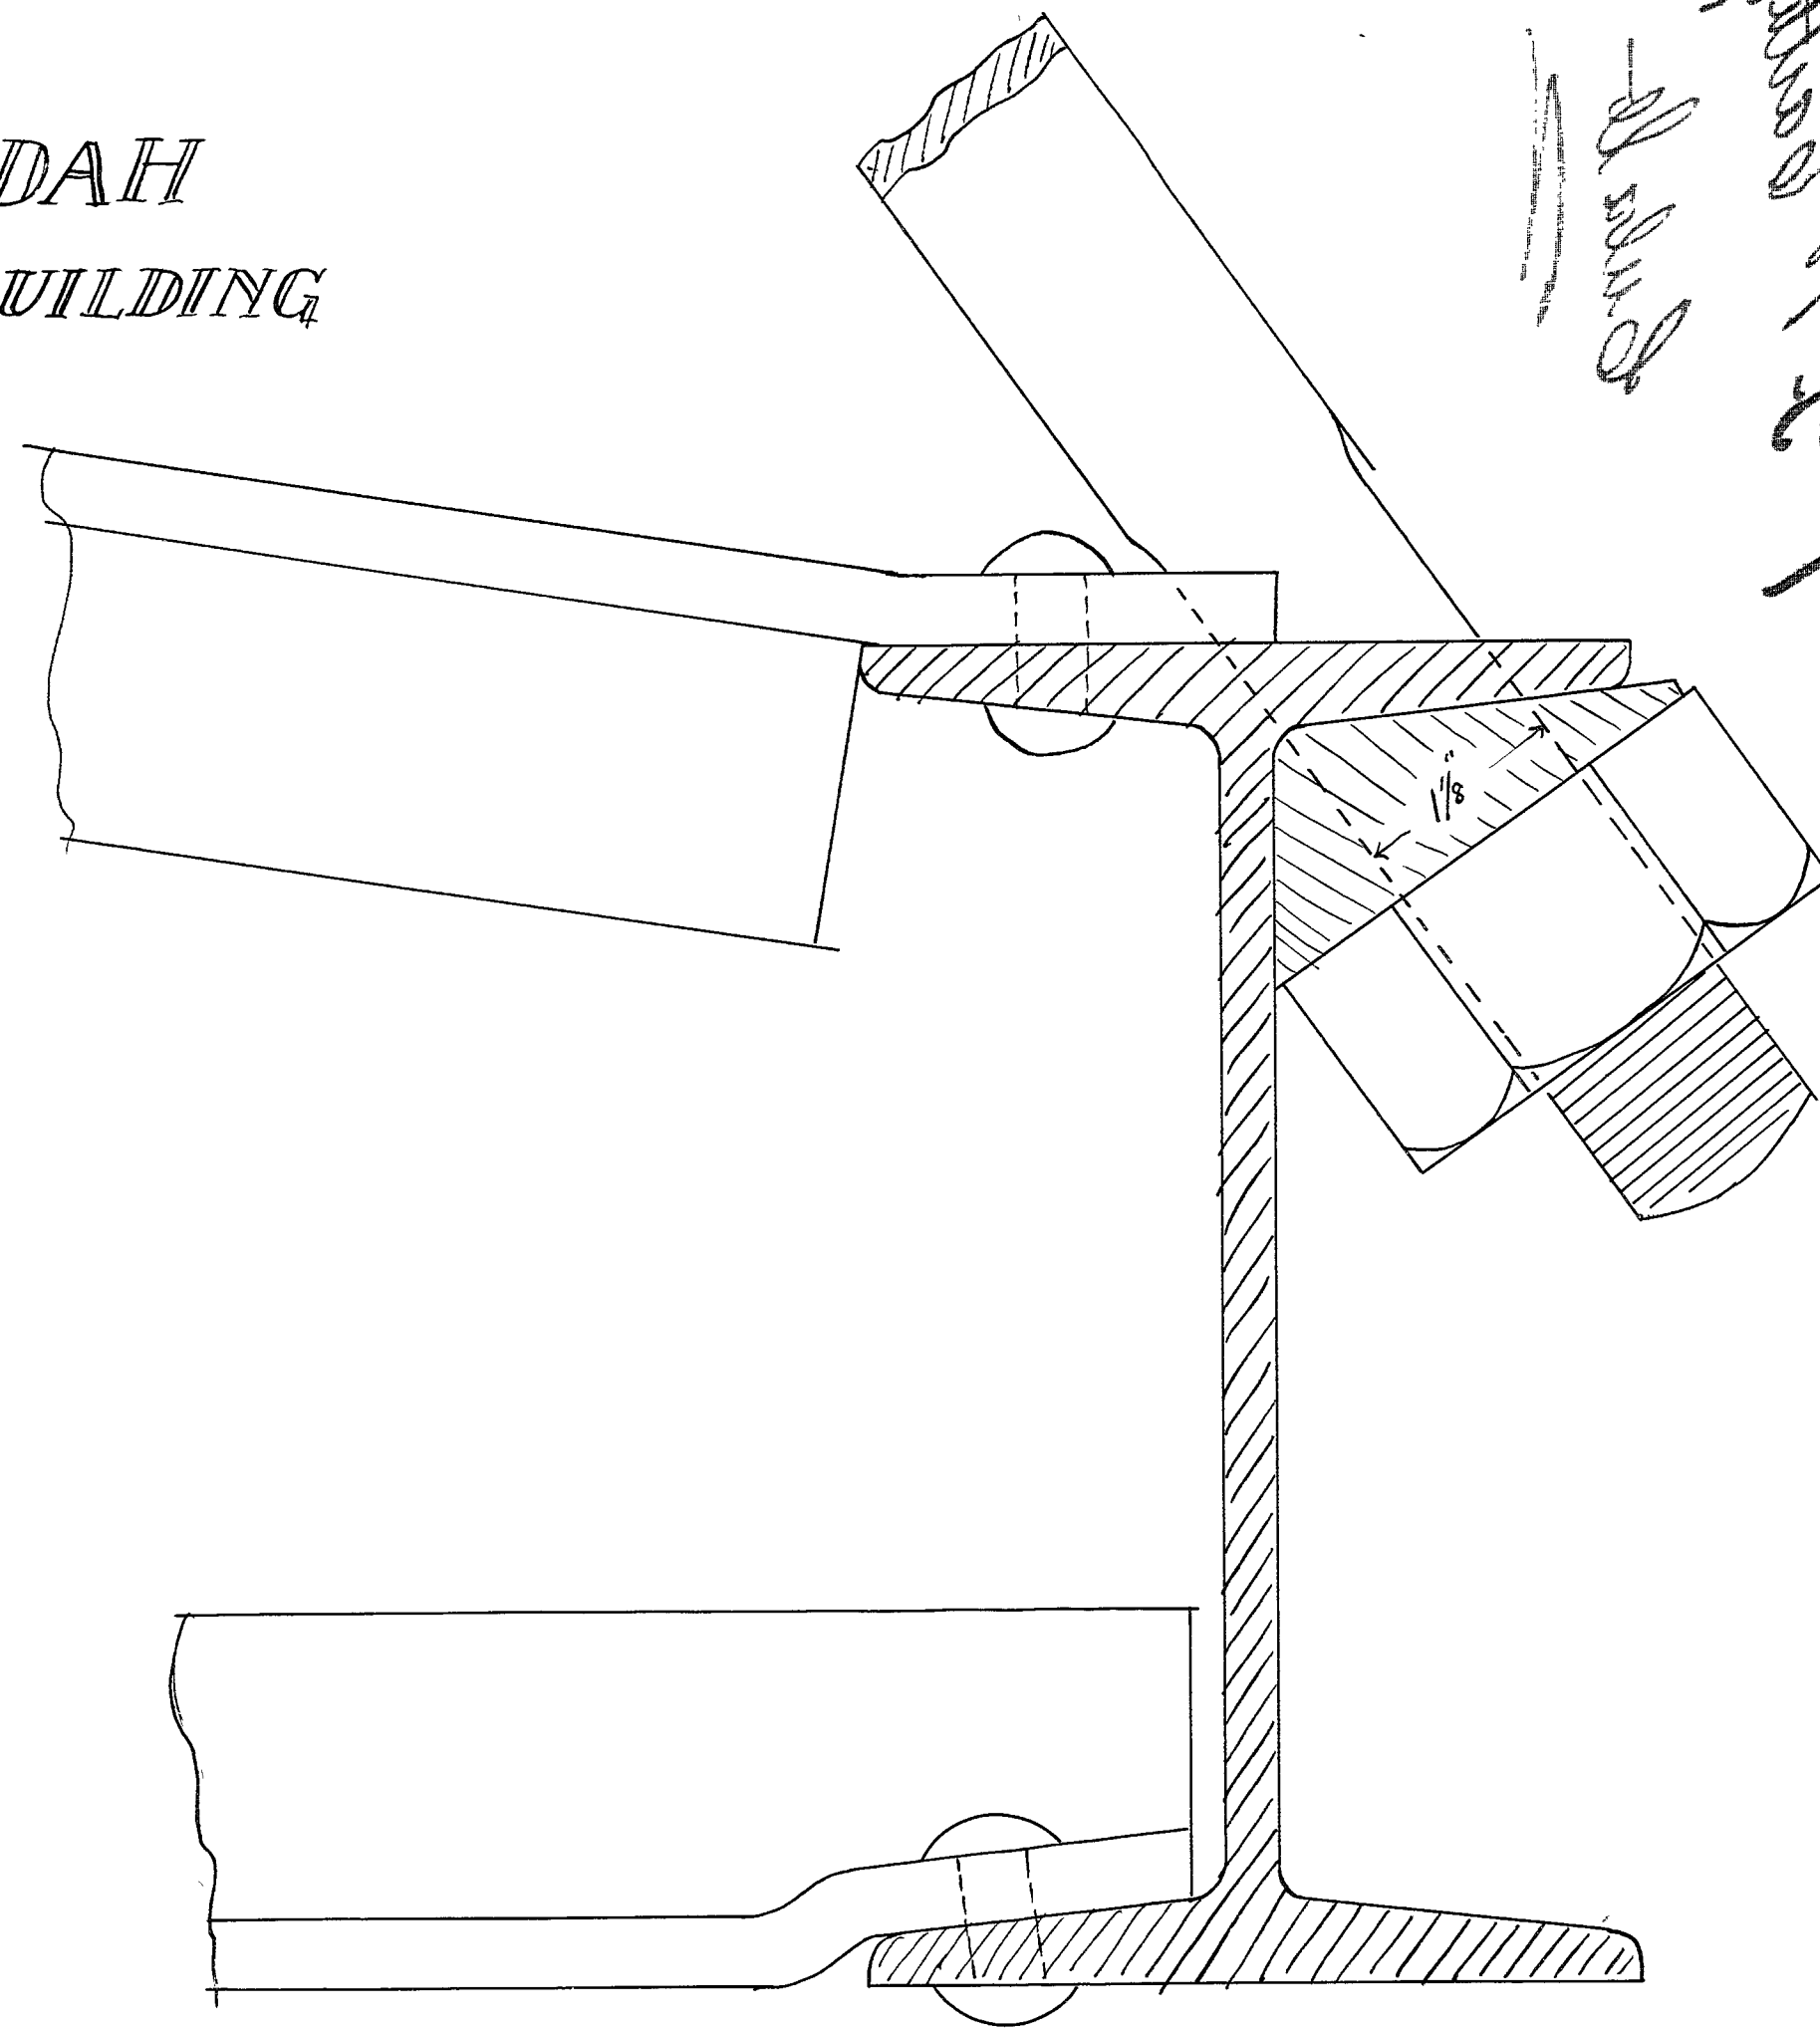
DETAILS OF VERANDAH FOR A CONCRETE BUILDING IN CUBA ST
